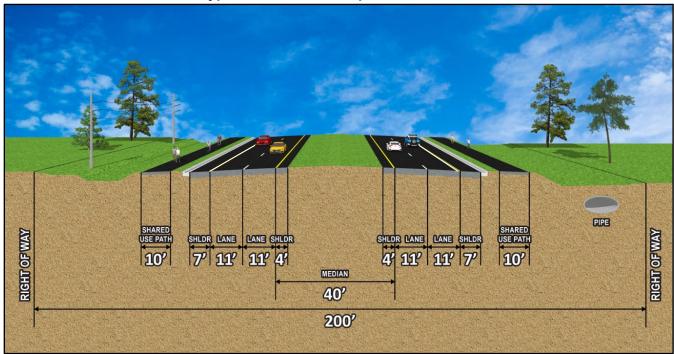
Build Alternative 2 Urban Typical Section with Pipe for Off-Site Flows
